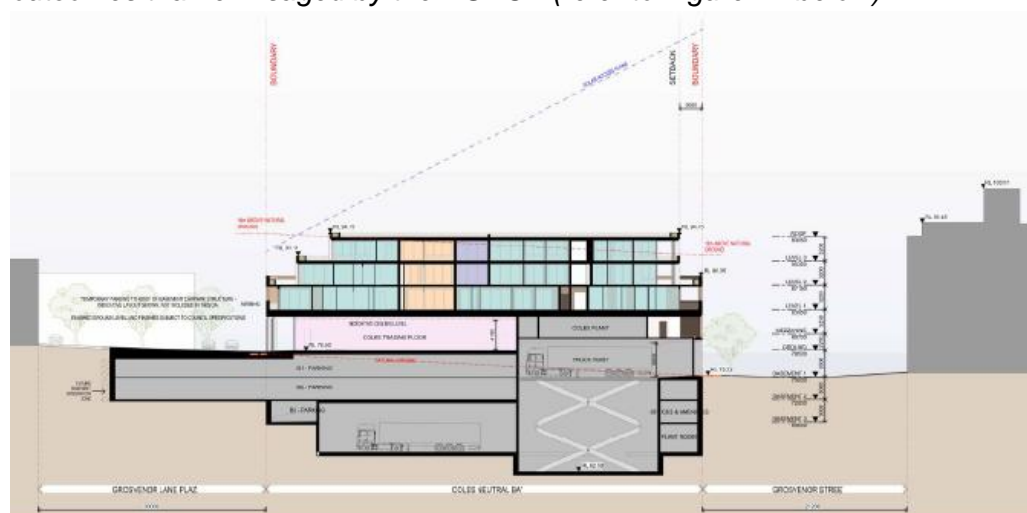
Section showing storeys below height limit adjacent to the plaza with 'lost' floor space shown in red cloud (Source: SJB Architects)
